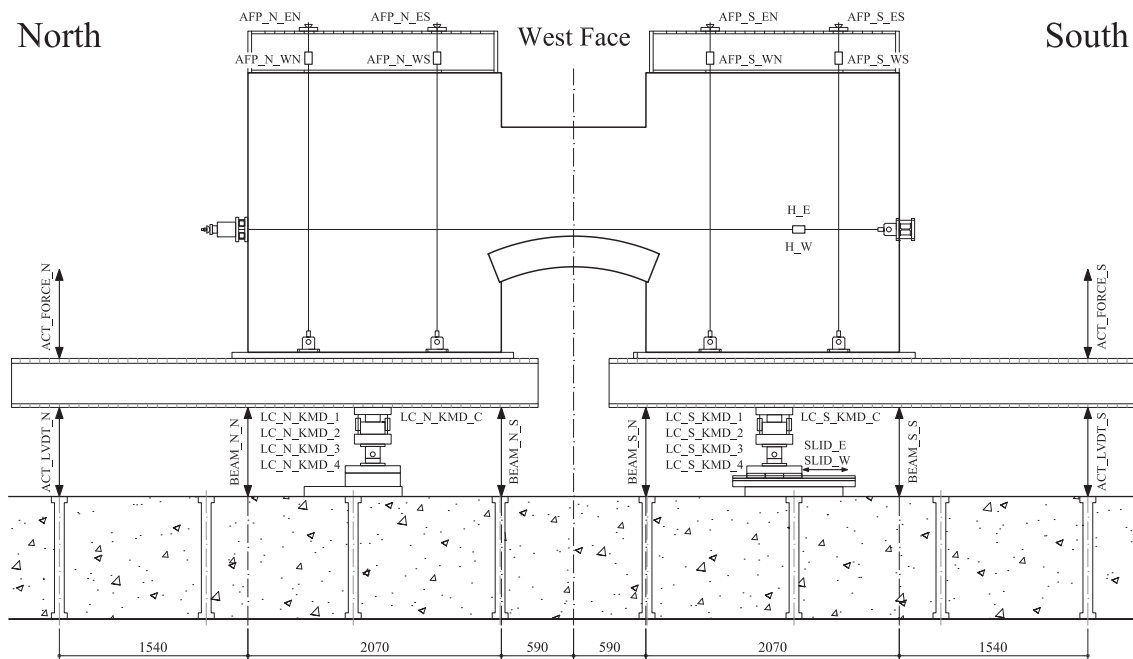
Layout of the hard-wired instruments for masonry spandrels with arch (TUC and TUD). West face, all dimensions in [mm].
